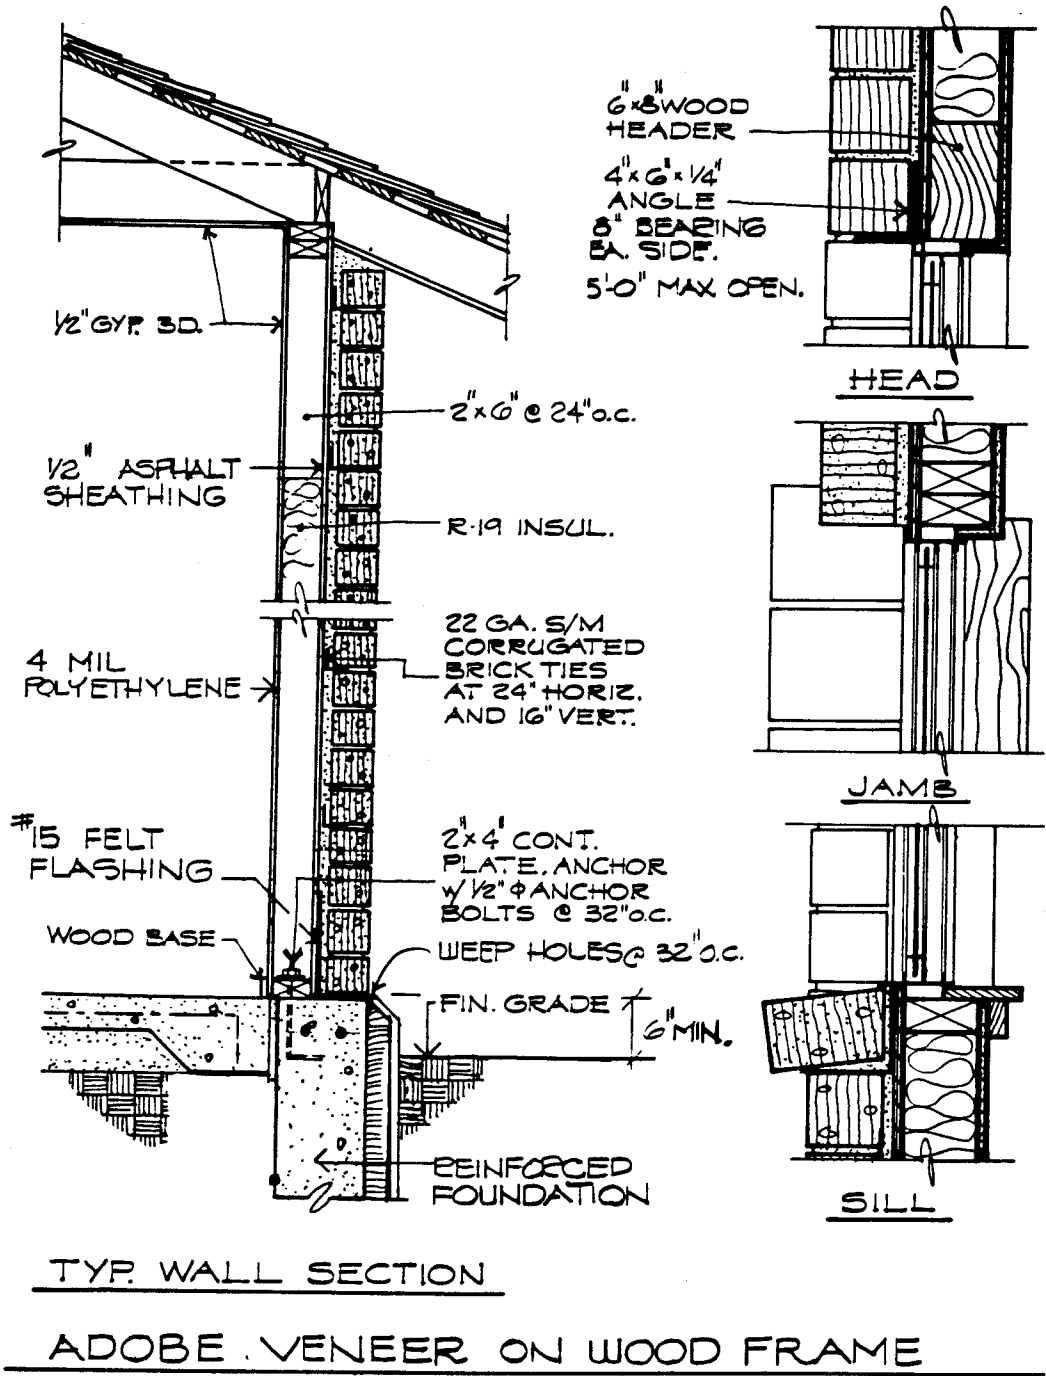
ADOBE VENEER OVER STUD WALL SECTION.
